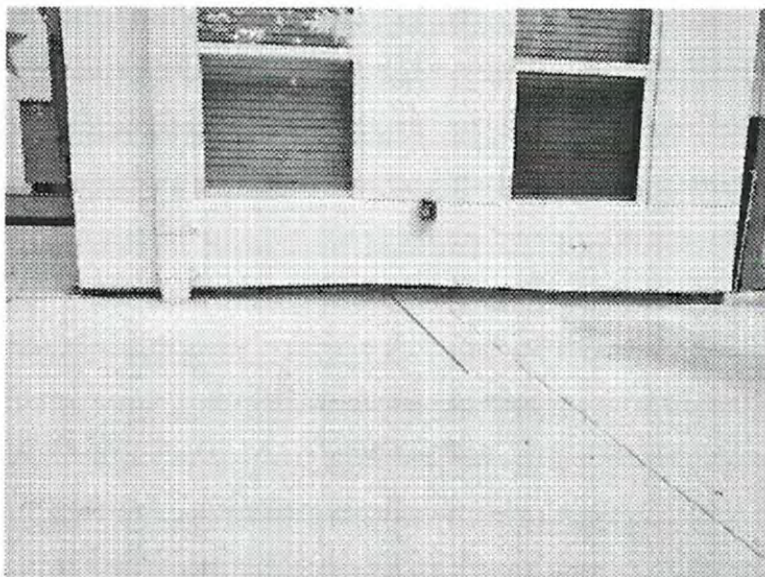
Uneven termination of stucco at wall base above garage vent on east side of Building A.
